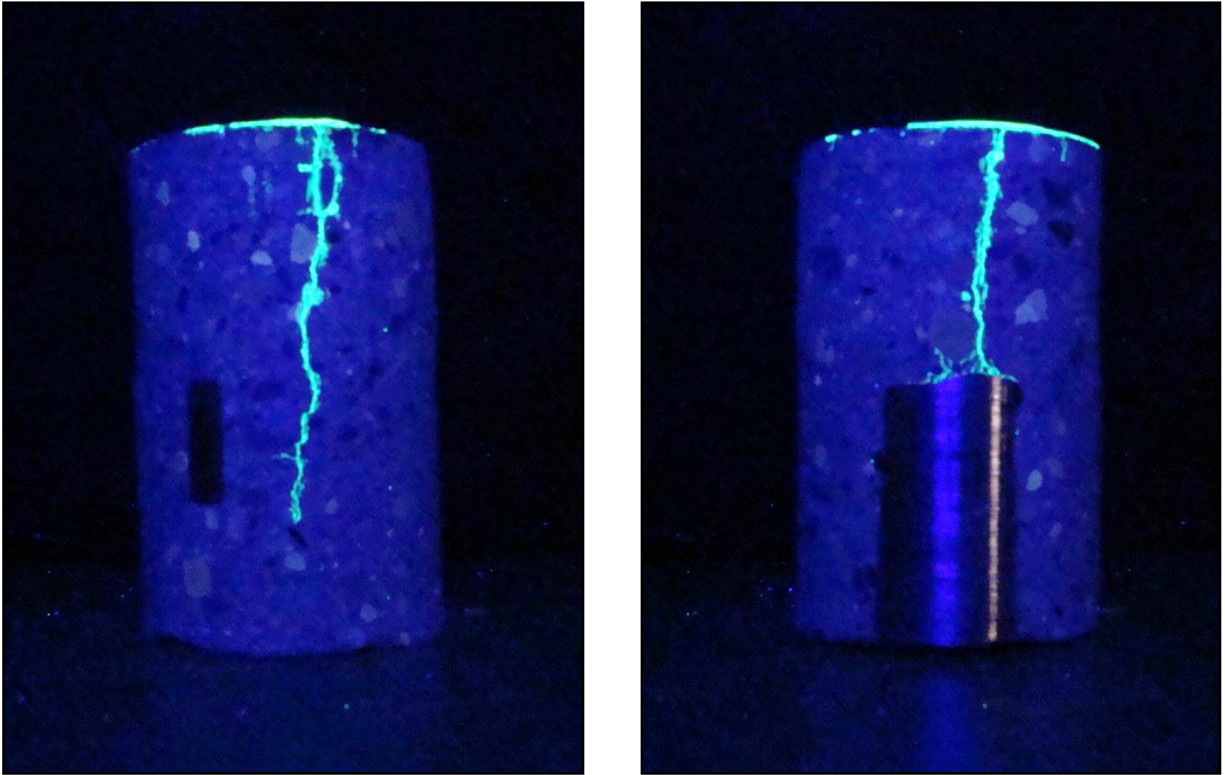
Core C2 (left) west elevation; (right) east elevation
